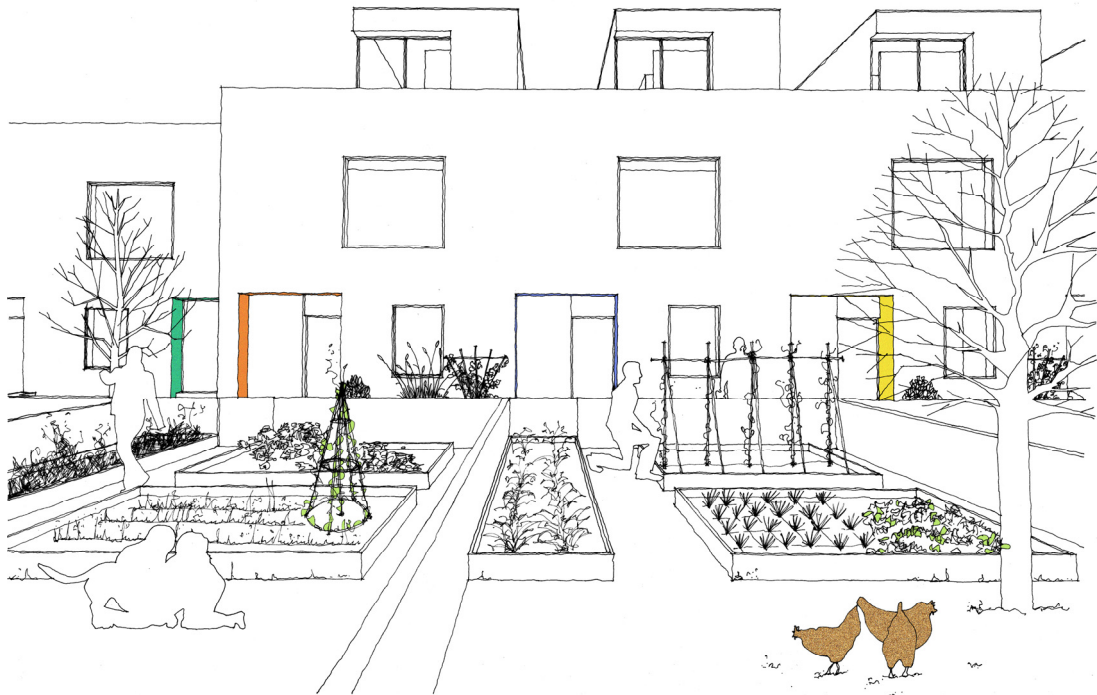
Perspective of allotment gardens and north façade; Fig. 6.74 Pedestrian street to the house fronts and allotment gardens opposite
